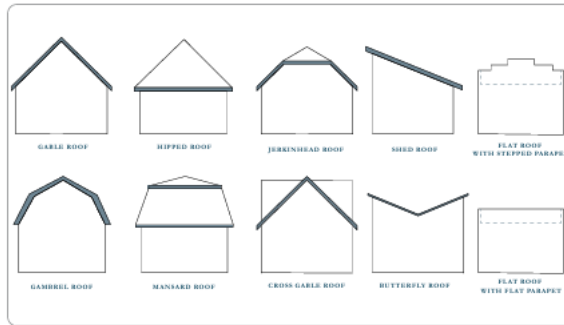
Diagram of typical roof forms (41.25.4.a.1-2).
